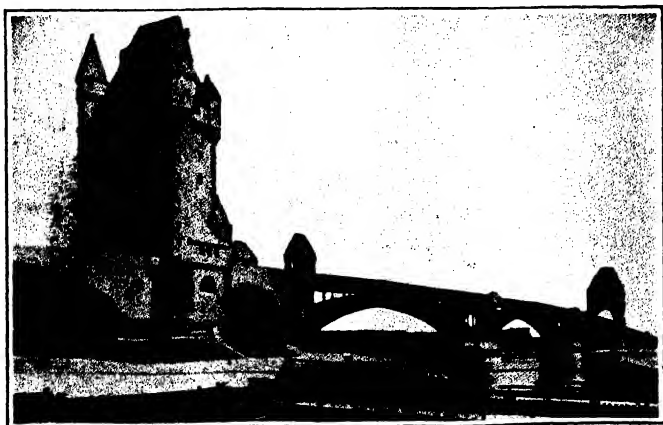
Piers of Worms highway bridge over the Rhine.
